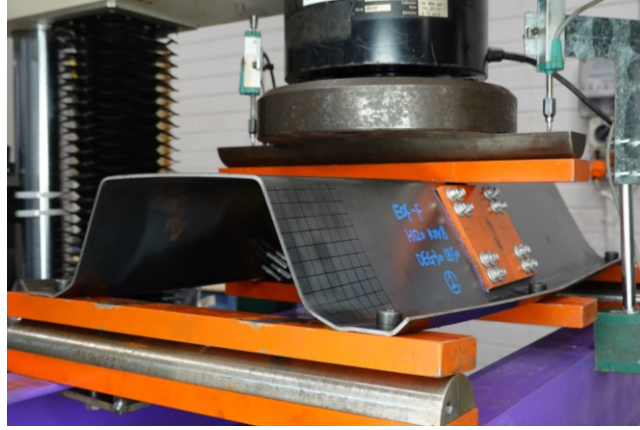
EOF-F-H120-RIN8-DEG30-N50, with 50 mm middle bearing plate
